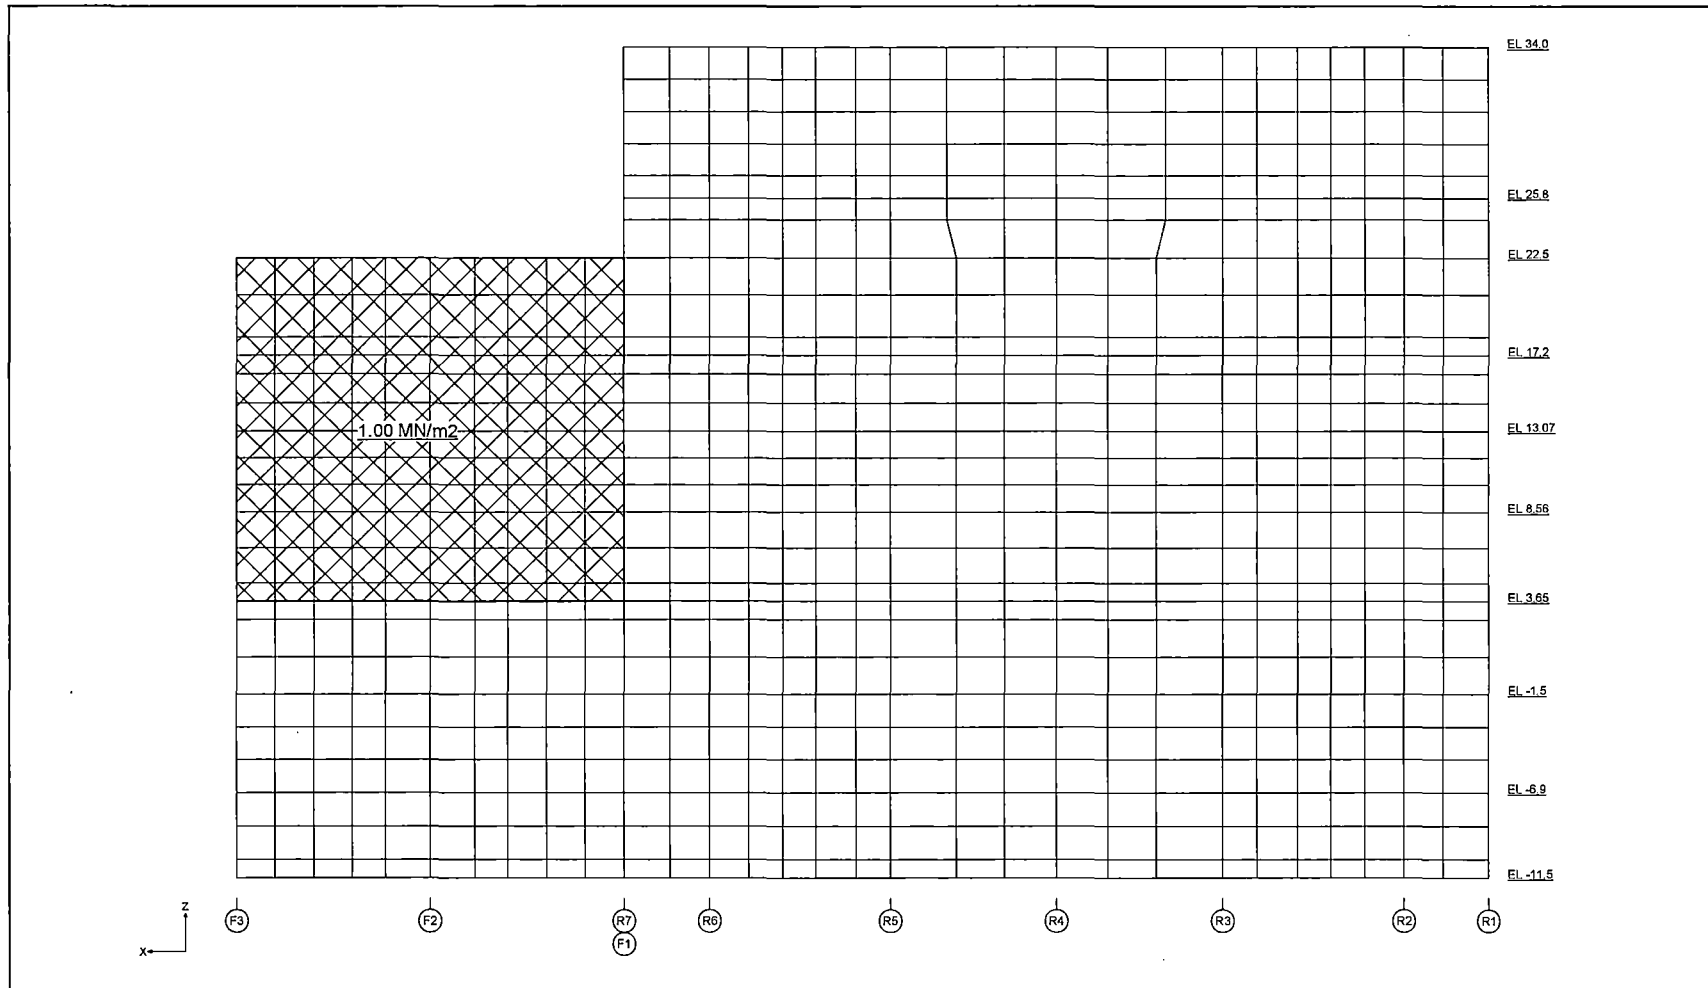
HELB Pressure Load (for FB General Rooms: FA Wall)
